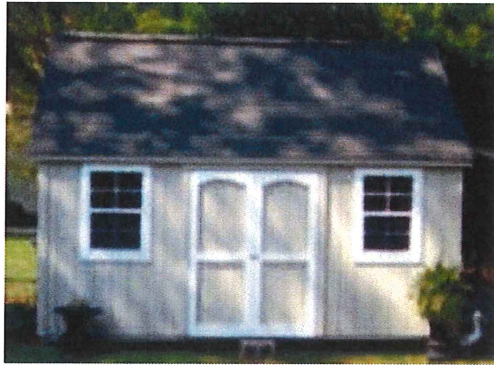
Image B. Example of proposed Master's line building. Does not include proposed batten detailing.
